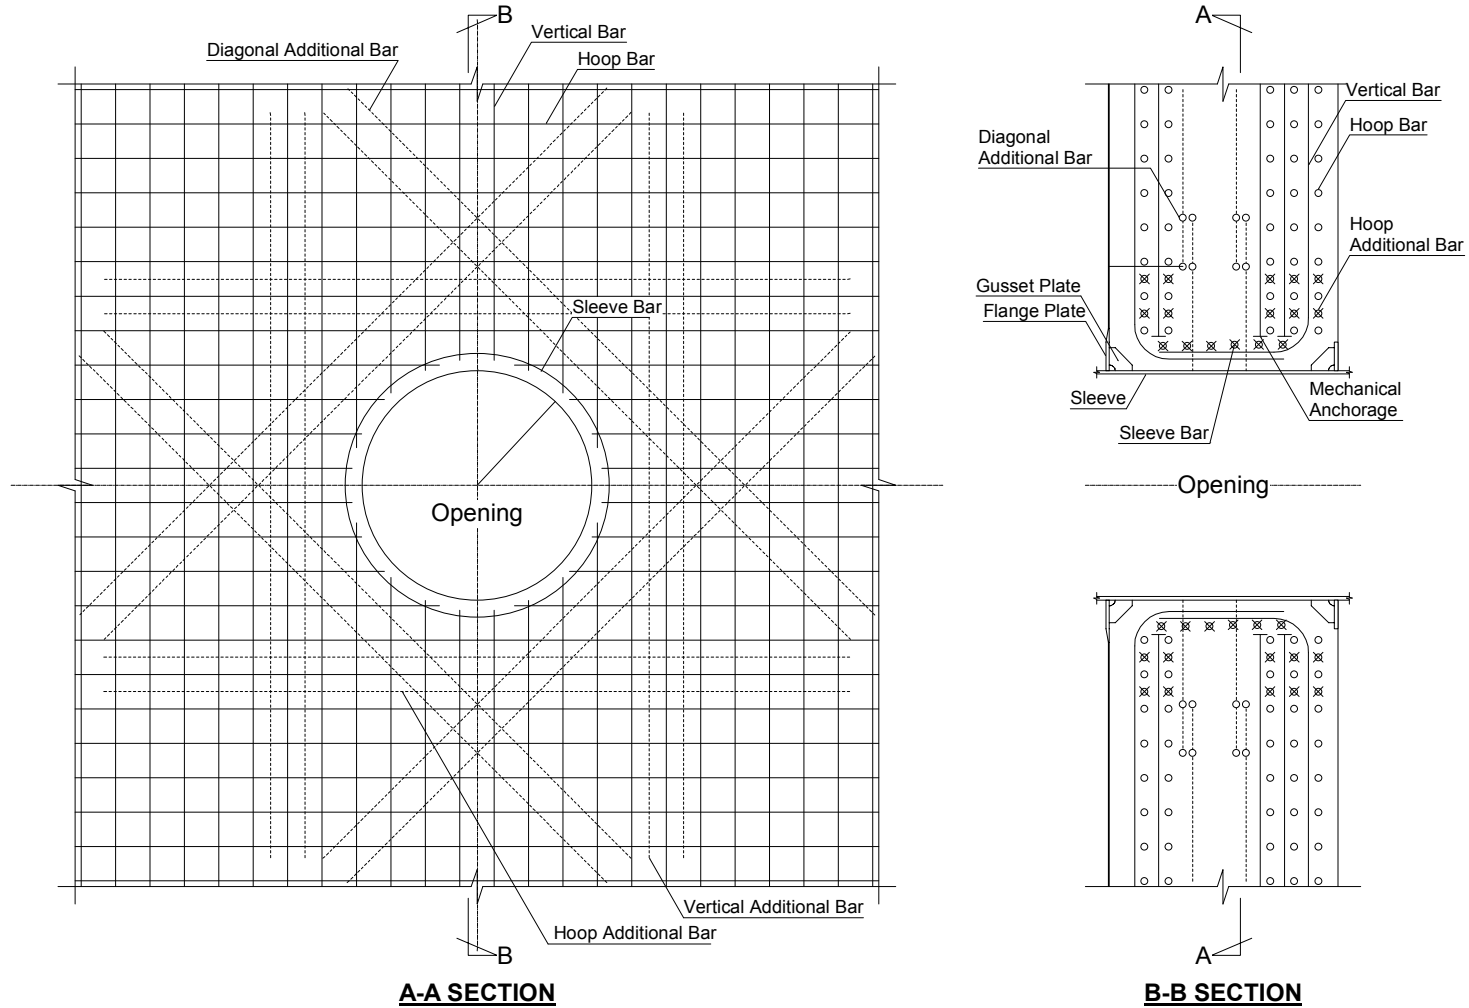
Schematic of Reinforcements in RCCV Wall Around Equipment Hatch/Personnel Airlock Opening
